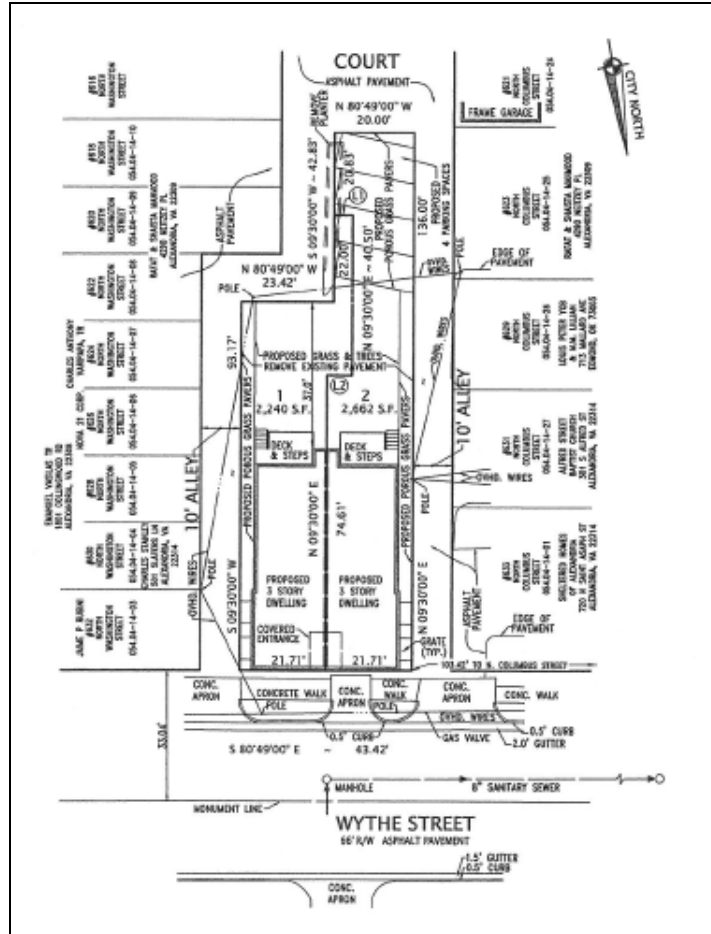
Plat showing subdivided lots and location of proposed dwellings.
